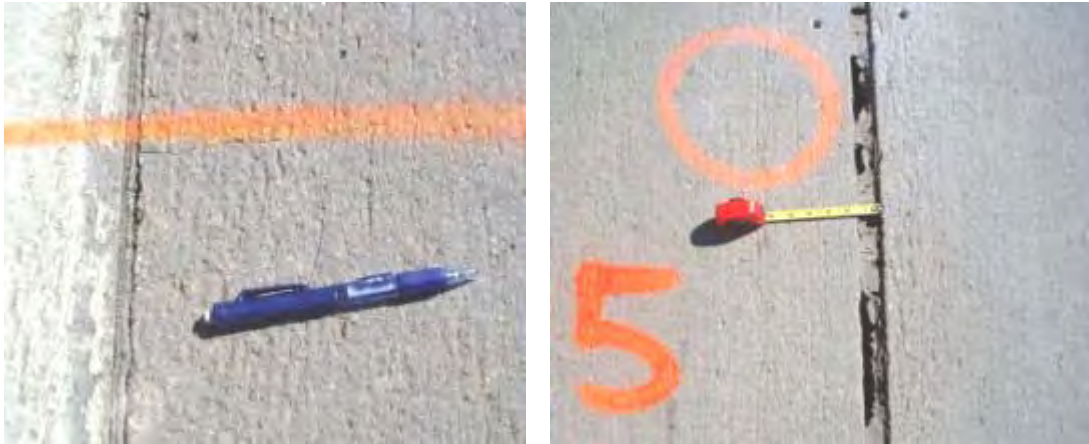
Control Joint A (left) with low-severity crack above a tie bar and Test Joint B (right) showing the sealant detached and with 1¼-in. opening.
